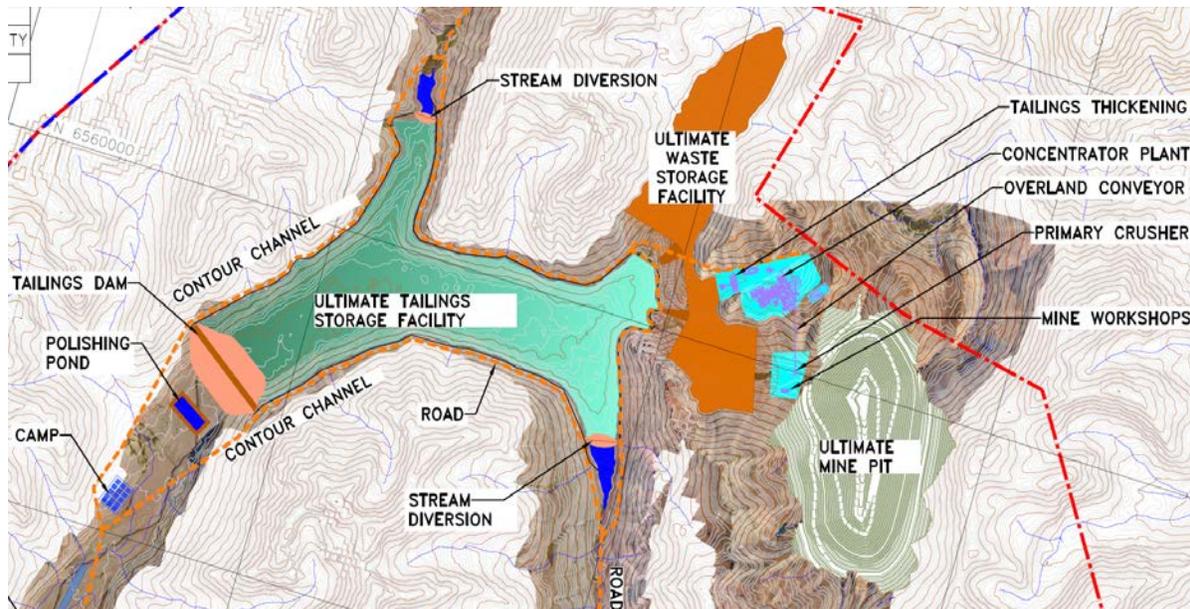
Extract from the Los Azules General Arrangement at Year 36.
